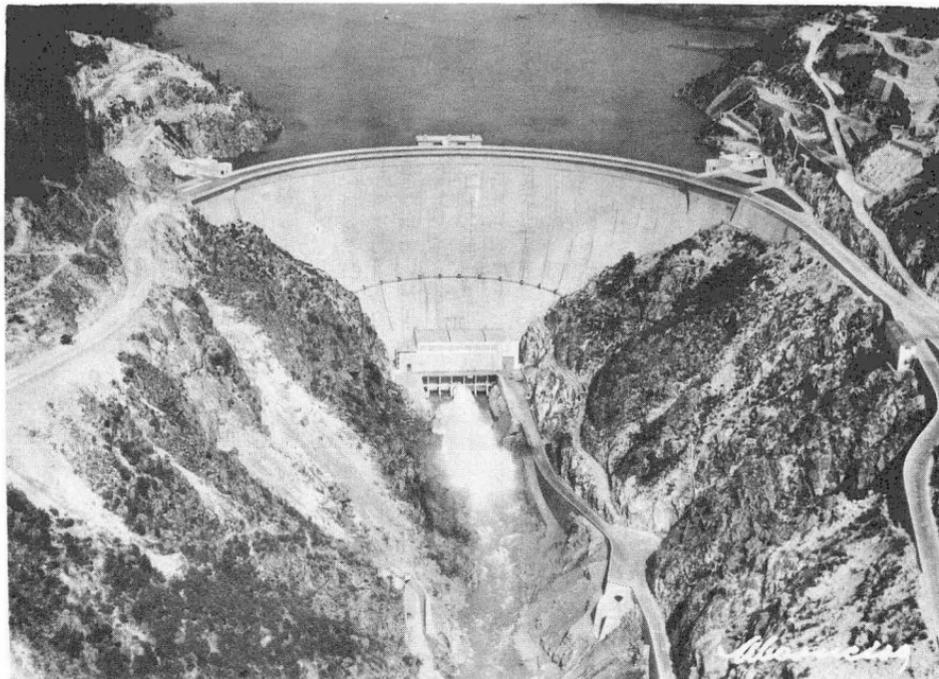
CABRIL - Downstream view of the dam, power station and outlets of the tunnels.
